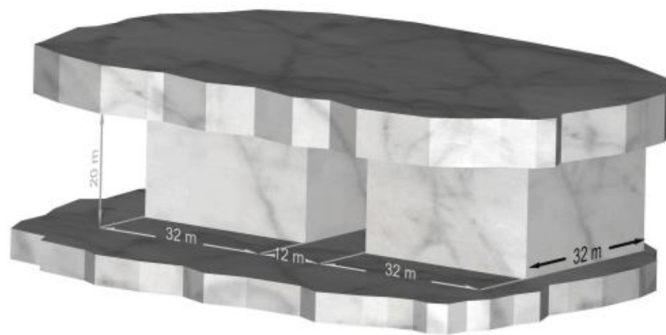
Room and pillar layout - Level 4 (Castro, 2015)
